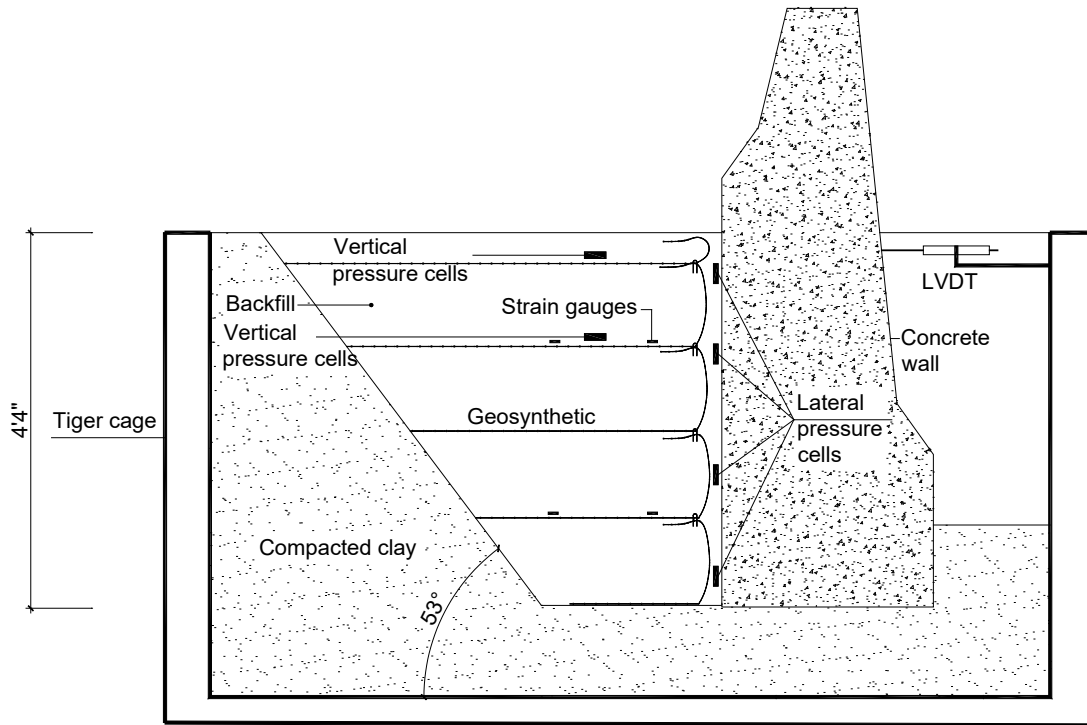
Model test of GRS wall with 12" spacing of wrapped around geosynthetic with (Test 2)
